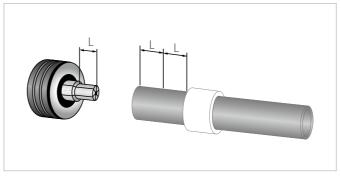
Minimum distance: between pipe end and compression sleeve
